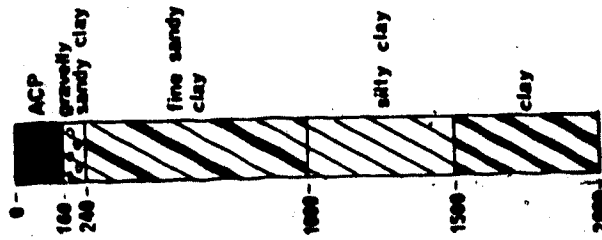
Project SR 661:02-2 (Non-cracking Section)
